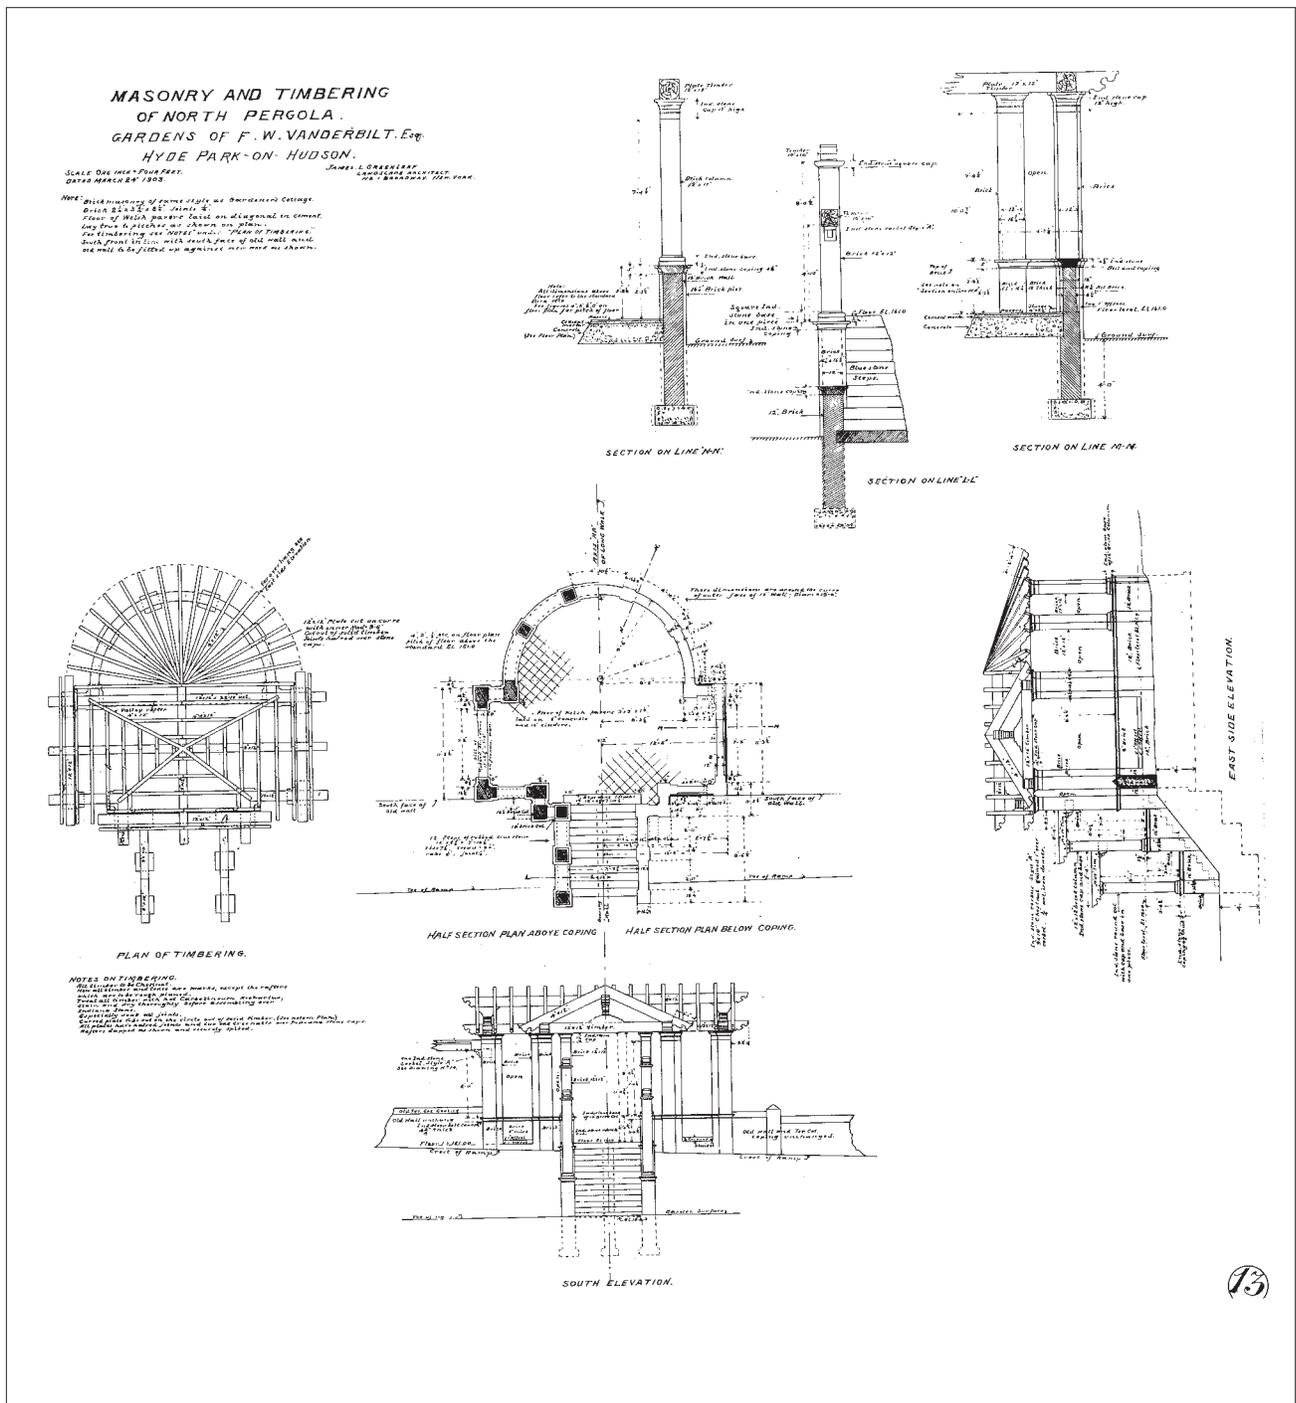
"Masonry and Timbering of North Pergola, Gardens of F. W. Vanderbilt Esq., Hyde Park-on-Hudson," James L. Greenleaf, Landscape Architect, Plan #13, March 24, 1903 (VAMA, no. V-104).
